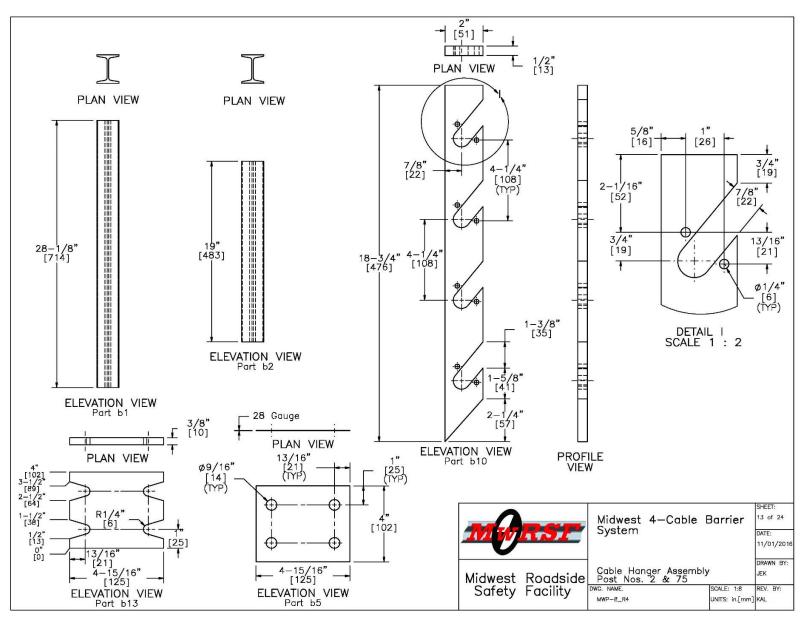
Cable Hanger Assembly, Post Nos. 2 and 75, Test No. MWP-8
